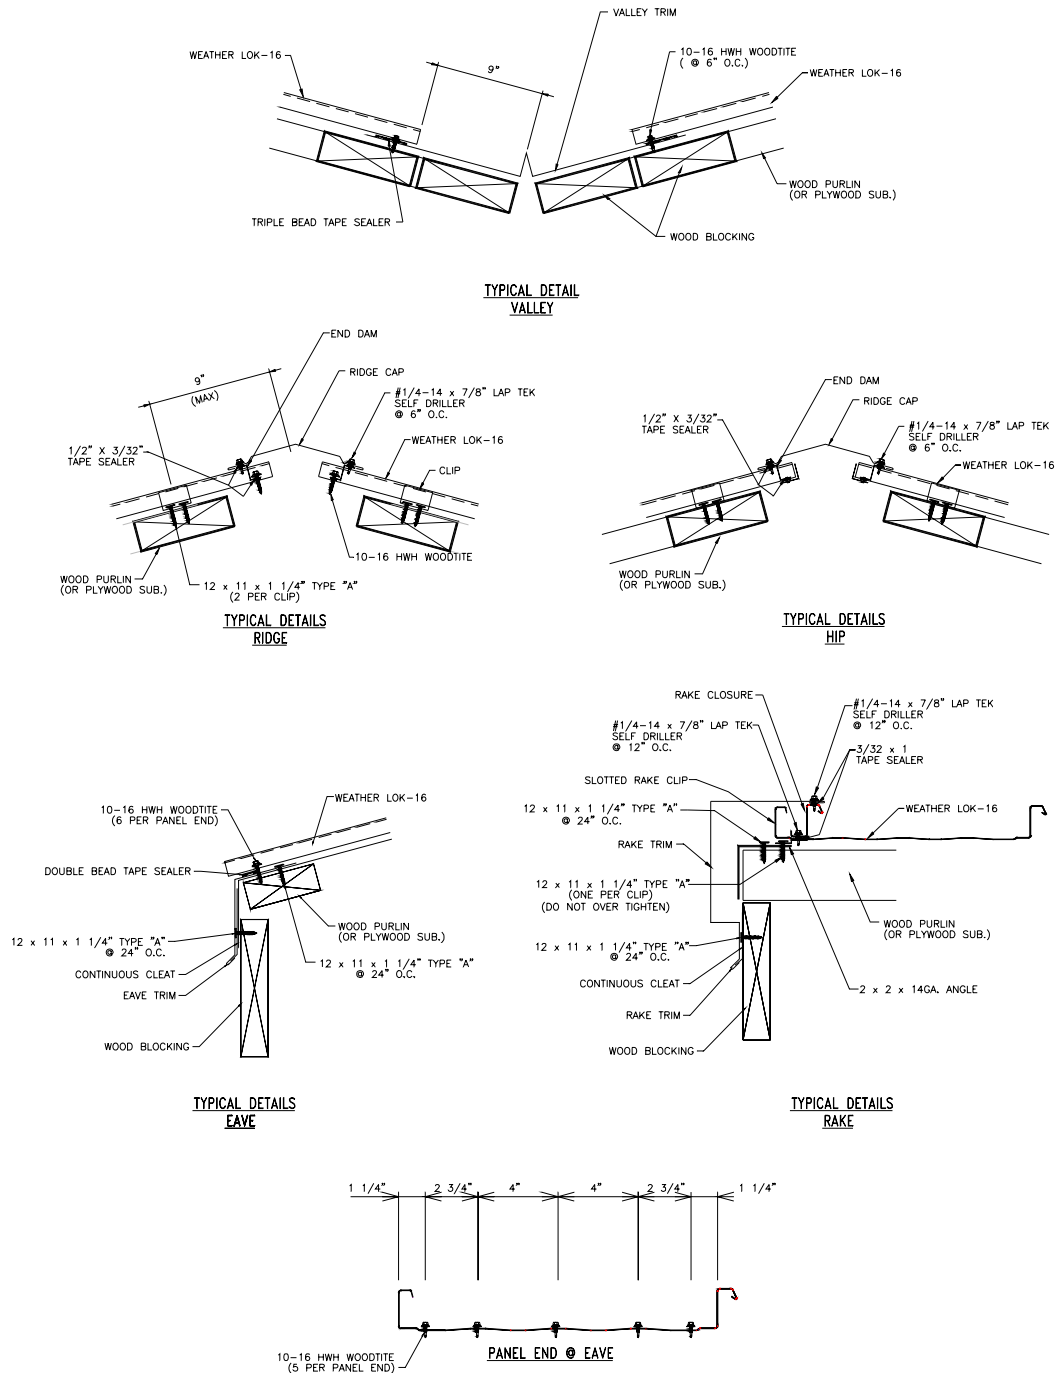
Weather Lok Panel Installation Over 2x4 Purlins – Details
